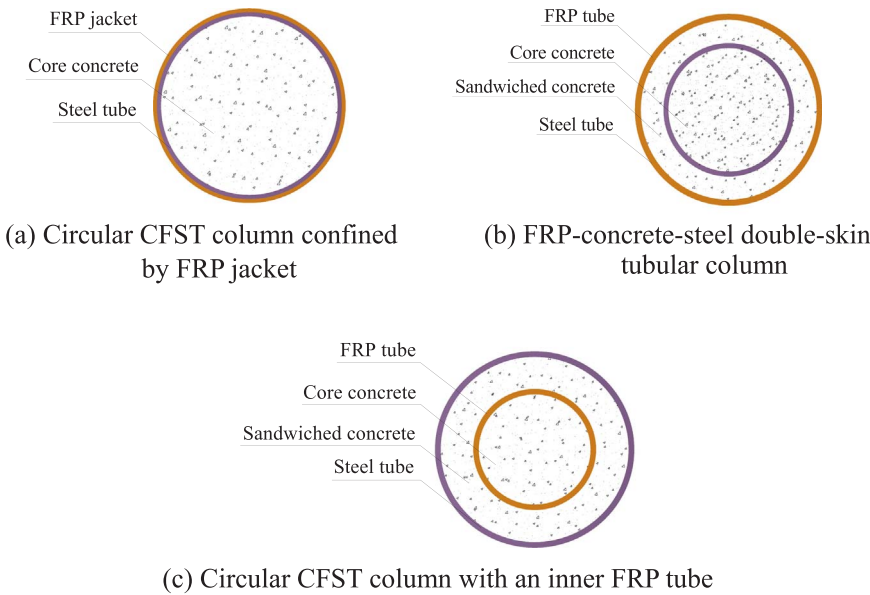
Different forms of concrete-filled steel and FRP tubular columns.
